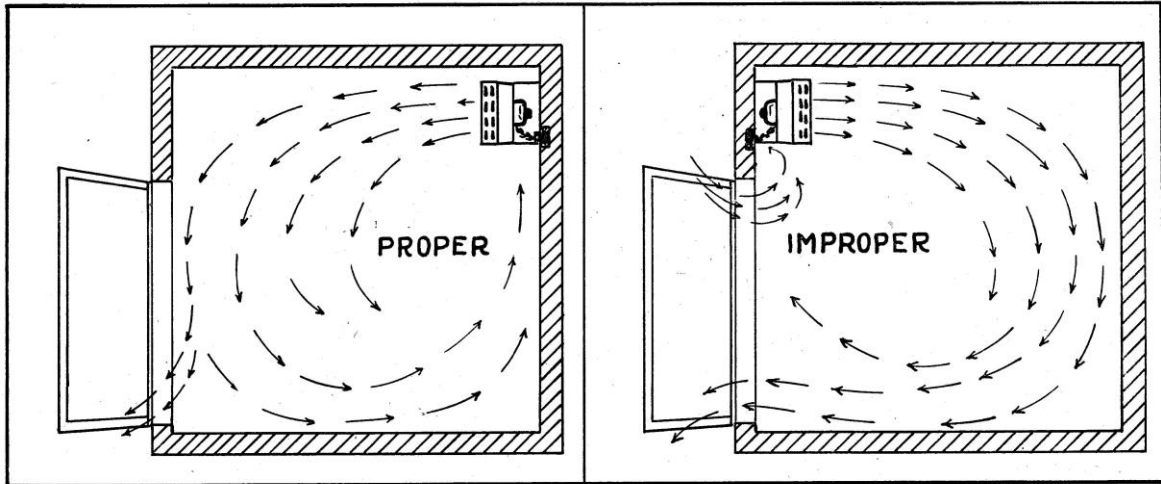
Diagram of Air Circulation in Refrigerator When Door is Open. Proper and Improper Installation of Forced Draft Coolers. Courtesy of Fedders Mfg. Co.
